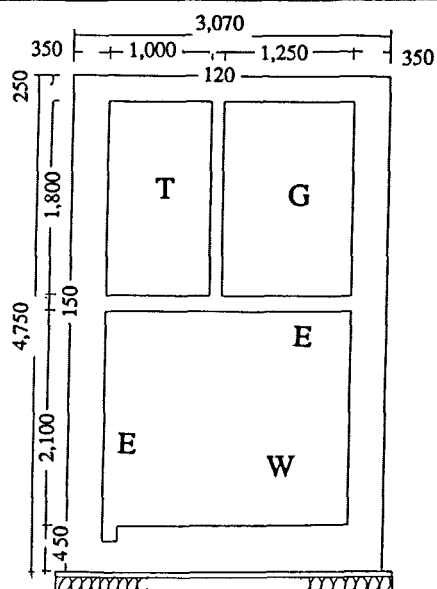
Cross Section of Kobe City Port Terminal Common Duct (units: mm)
